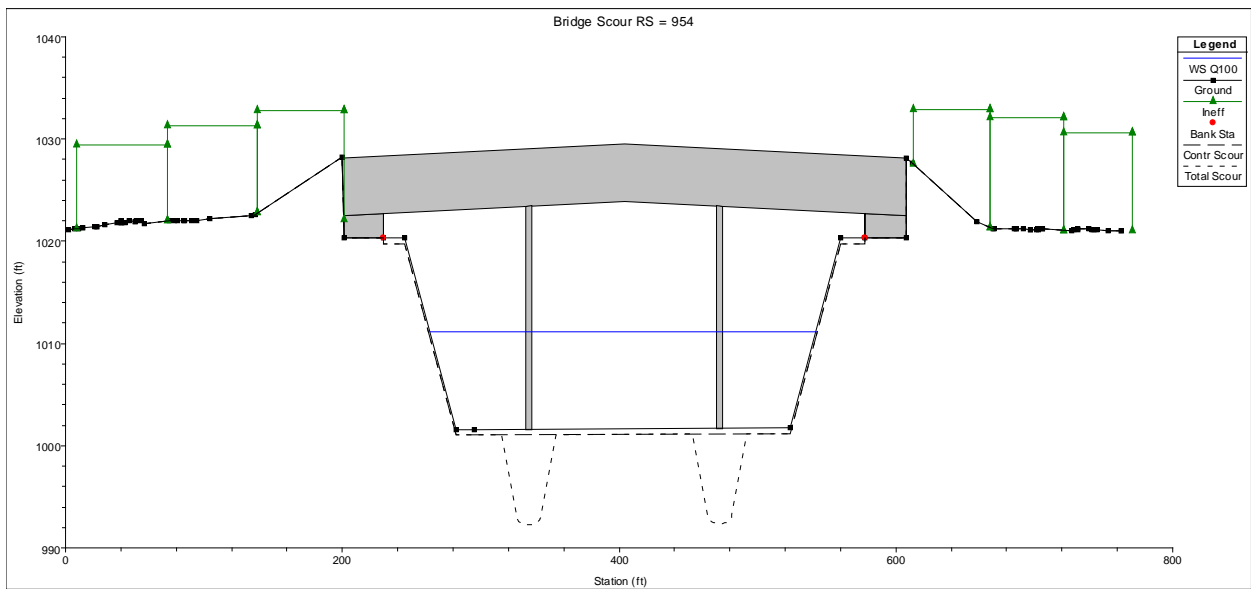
Scour of Proposed Bridge Piers in Ultimate Condition for Q100.
